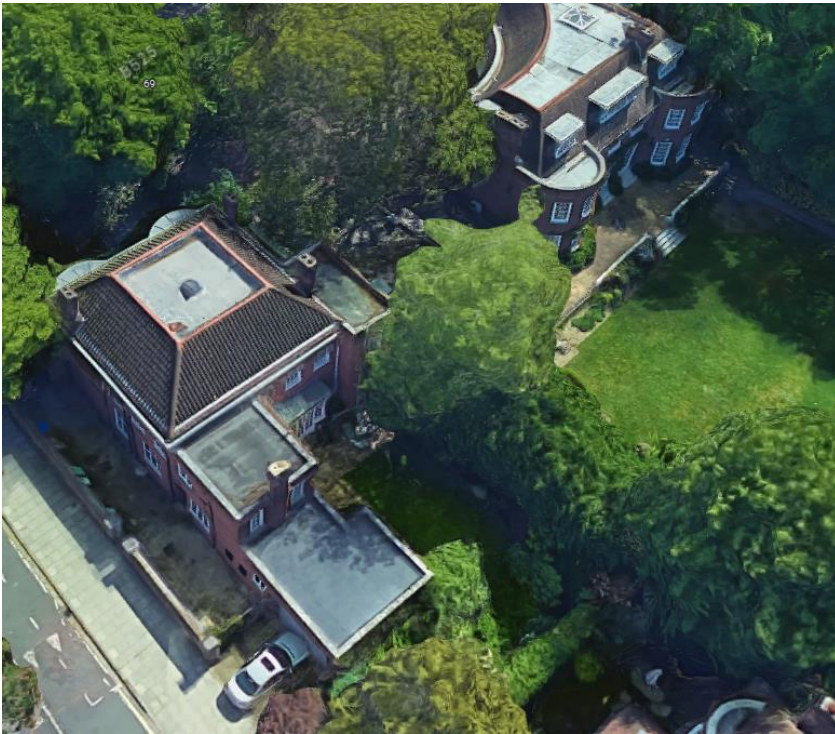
Aerial view showing existing boundary between application site and No.69 Avenue Road.
